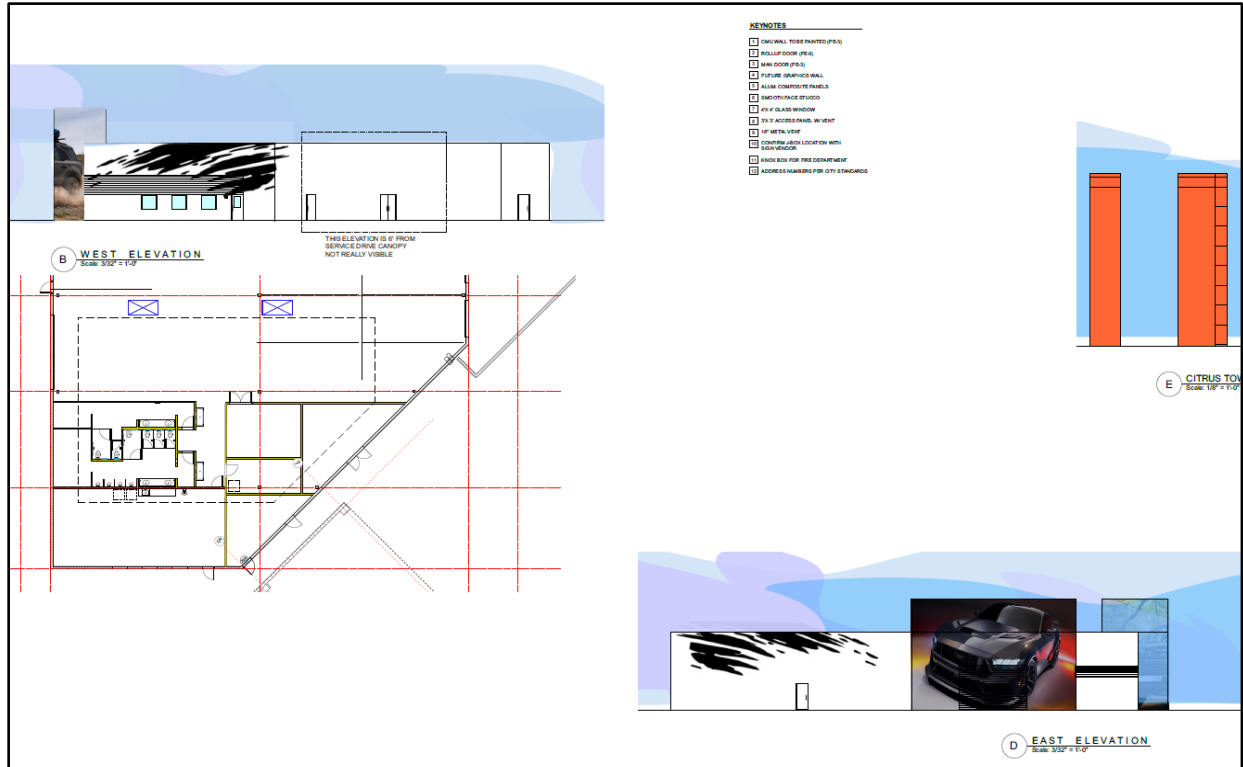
Exhibit M: KIA SHOWROOM FLOOR PLAN
